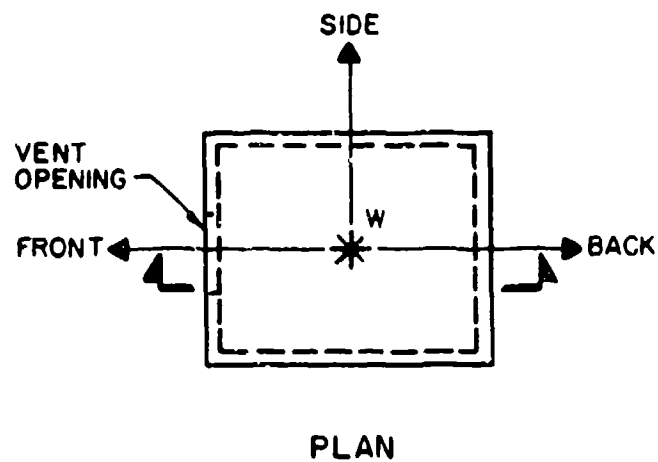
Four wall cubicle vented through a wall and direction of blast wave propagation
